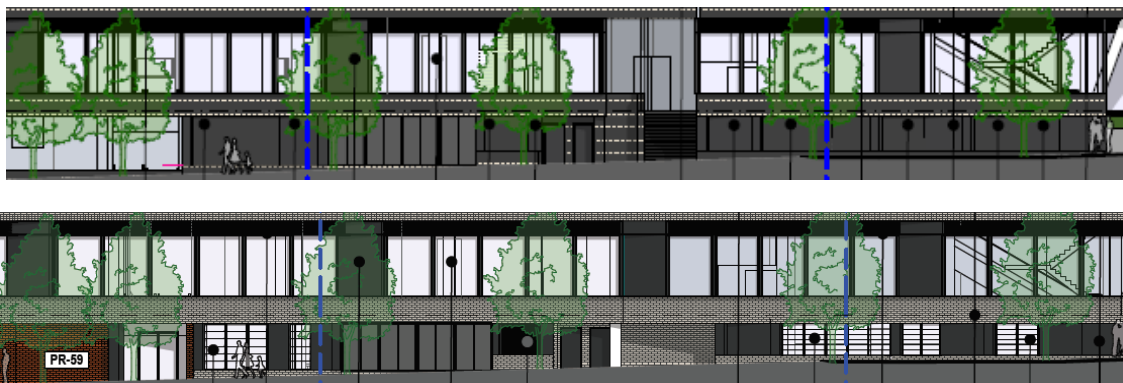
Existing lower ground floor east elevation (top) and proposed lower ground east elevation (bottom)
